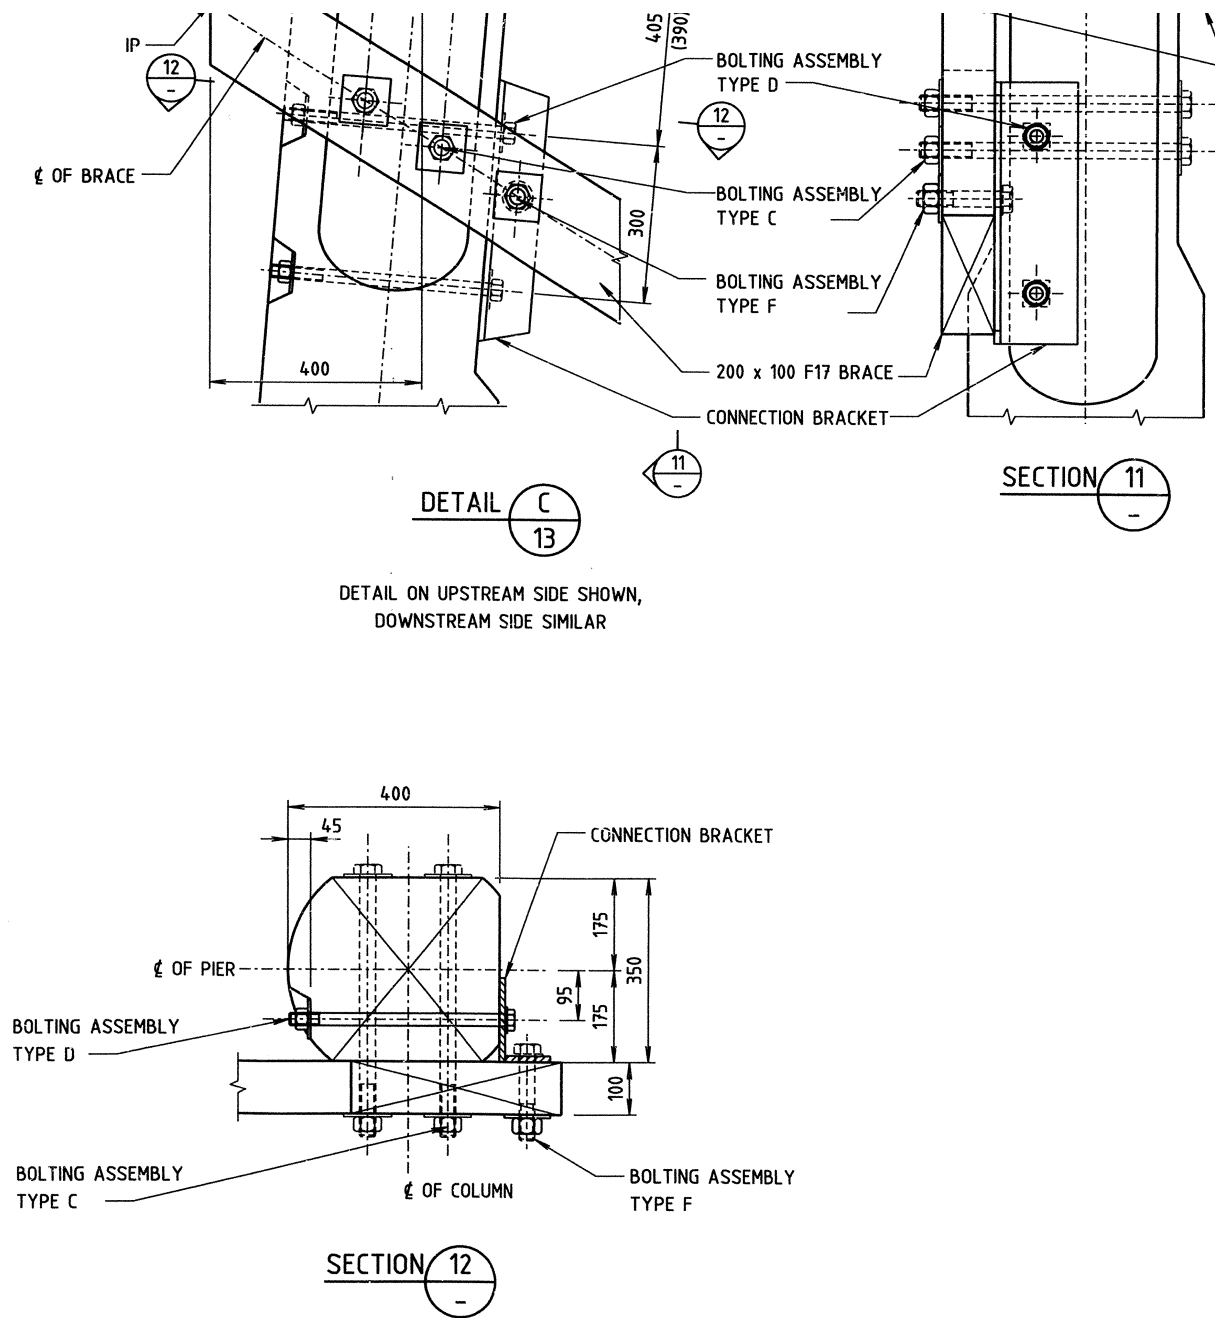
Poor Connection Detailing Neglecting Consideration of Timber Shrinkage
